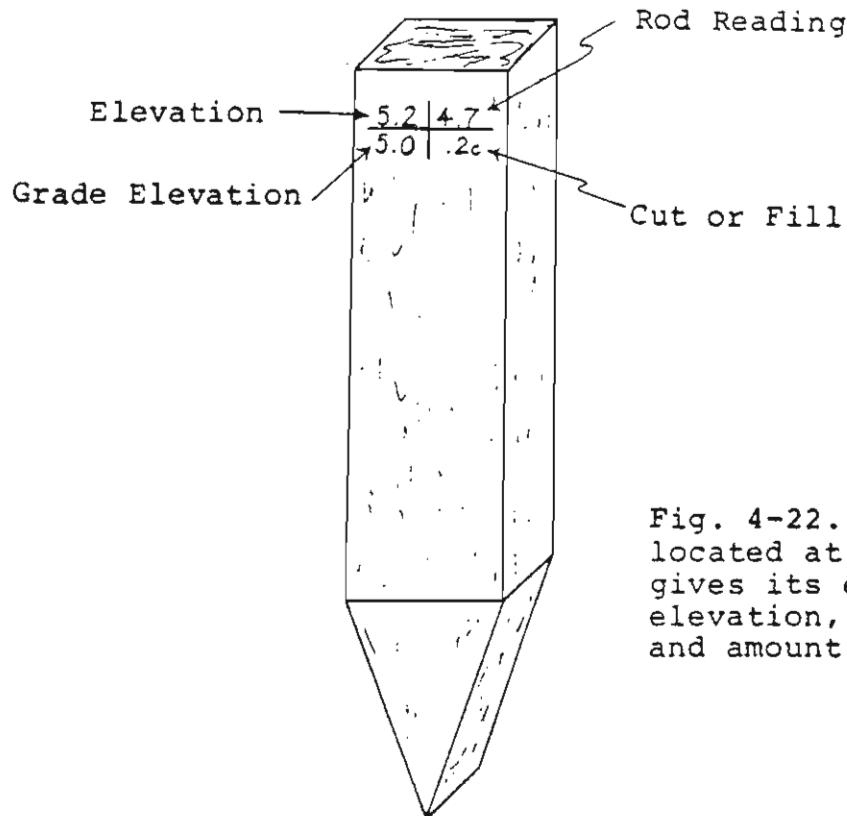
Field stakes located at each station gives its elevation, grade elevation, rod reading, and amount of cut or fill.
